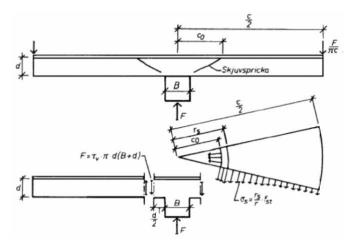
The load case with a circular plate supported by a circular column. c_0 distance from the column to top of shear crack (skjuspricka), c diameter of the slab over the column where the radial bending moment is zero, F is design shear force, r_s radius within which the flexural reinforcement has reached yield strength (Kölfors, 1993).
